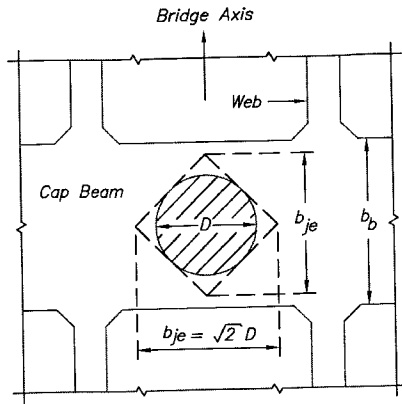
Effective Joint Width for Joint Shear Stress Calculations
